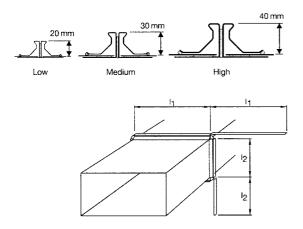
Slip joints on rectangular ducts add to the space requirement. At installation free space has to be available for the joint connection.
